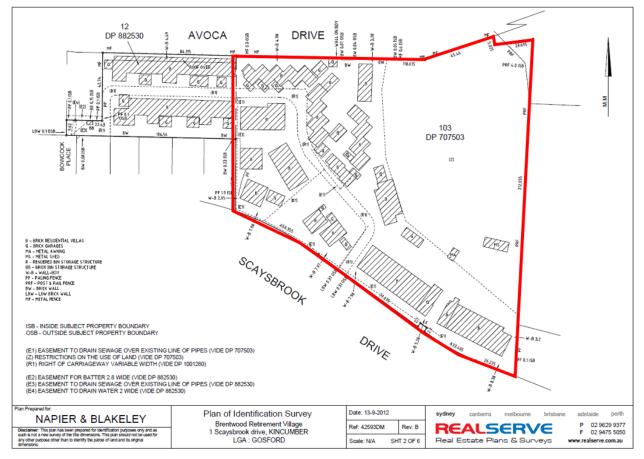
Extract from Survey Plan of Subject Site (Source: Real Serve)
